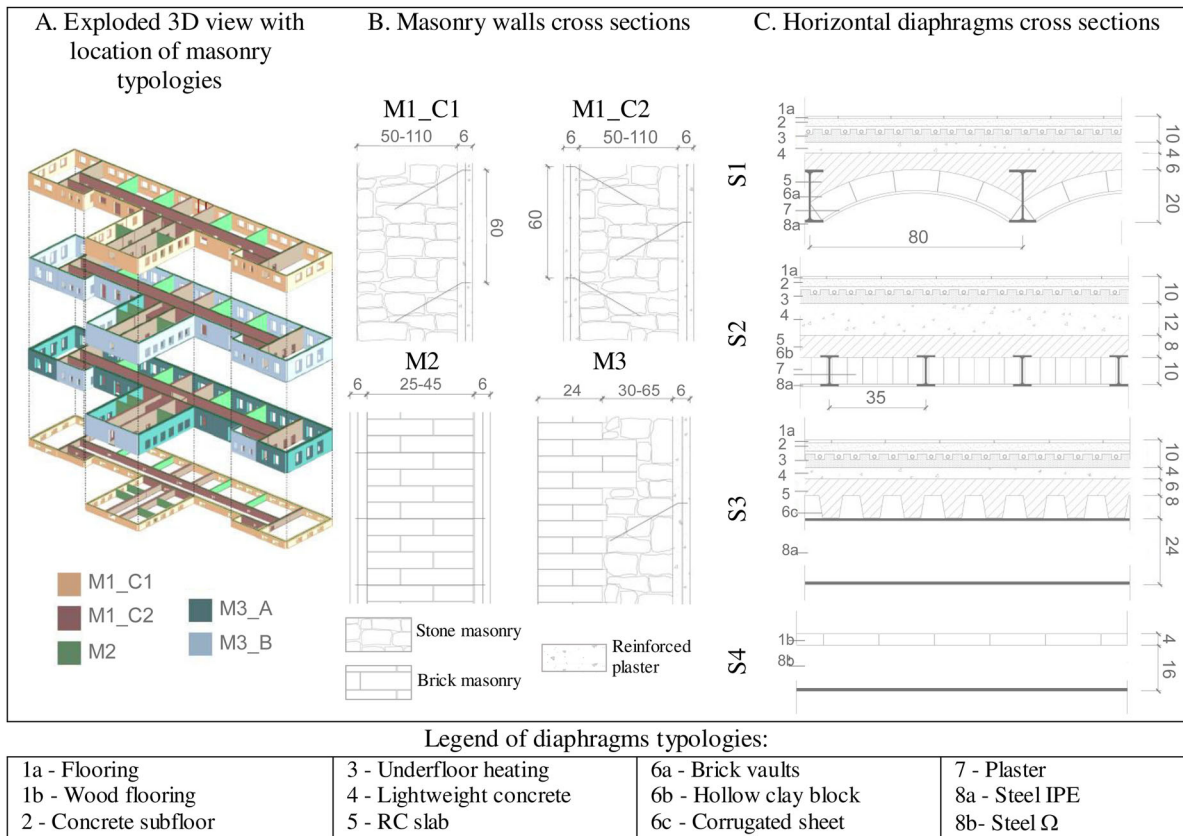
Exploded 3D view with location of masonry typologies (A), masonry walls cross-sections (B) and horizontal diaphragms cross-sections (C) in the building (units in cm). In (B), the thickness range of masonry leaves is indicated, too
